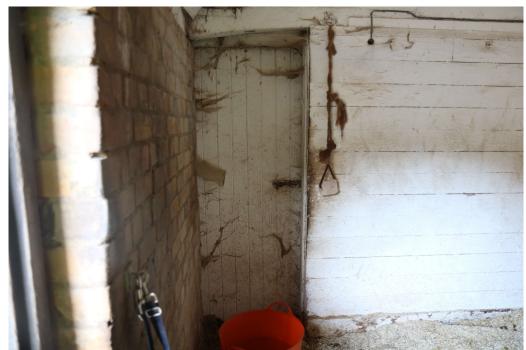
Detail of partition between stable 2 and stable 1, viewed from stable 2. Photograph taken facing north.
